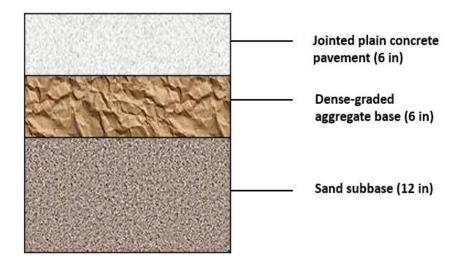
Cross Section of Low-Volume Concrete on M-13 and M-99
